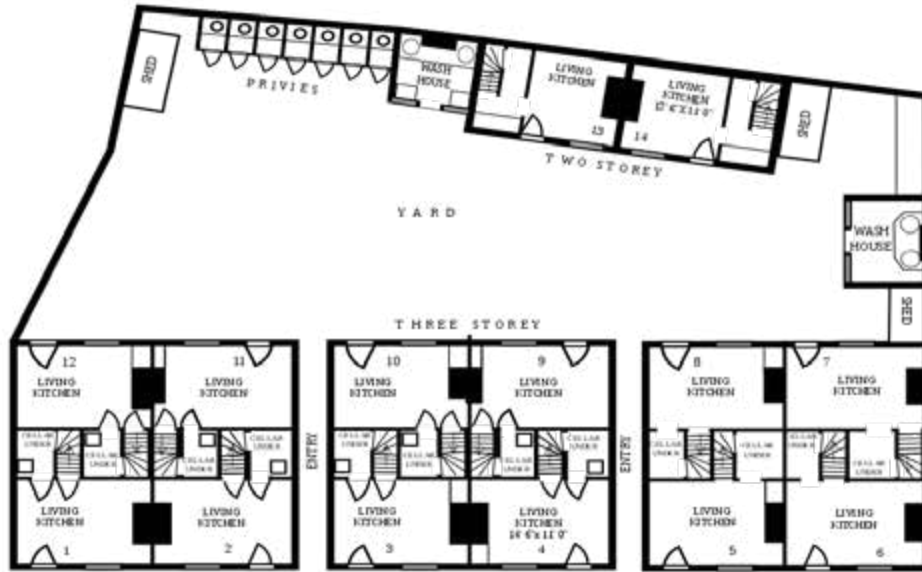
A typical yard of 14 back-to-back houses. Note the shared “privies” (outdoor toilets) and “wash houses” (URL1., 2018)
